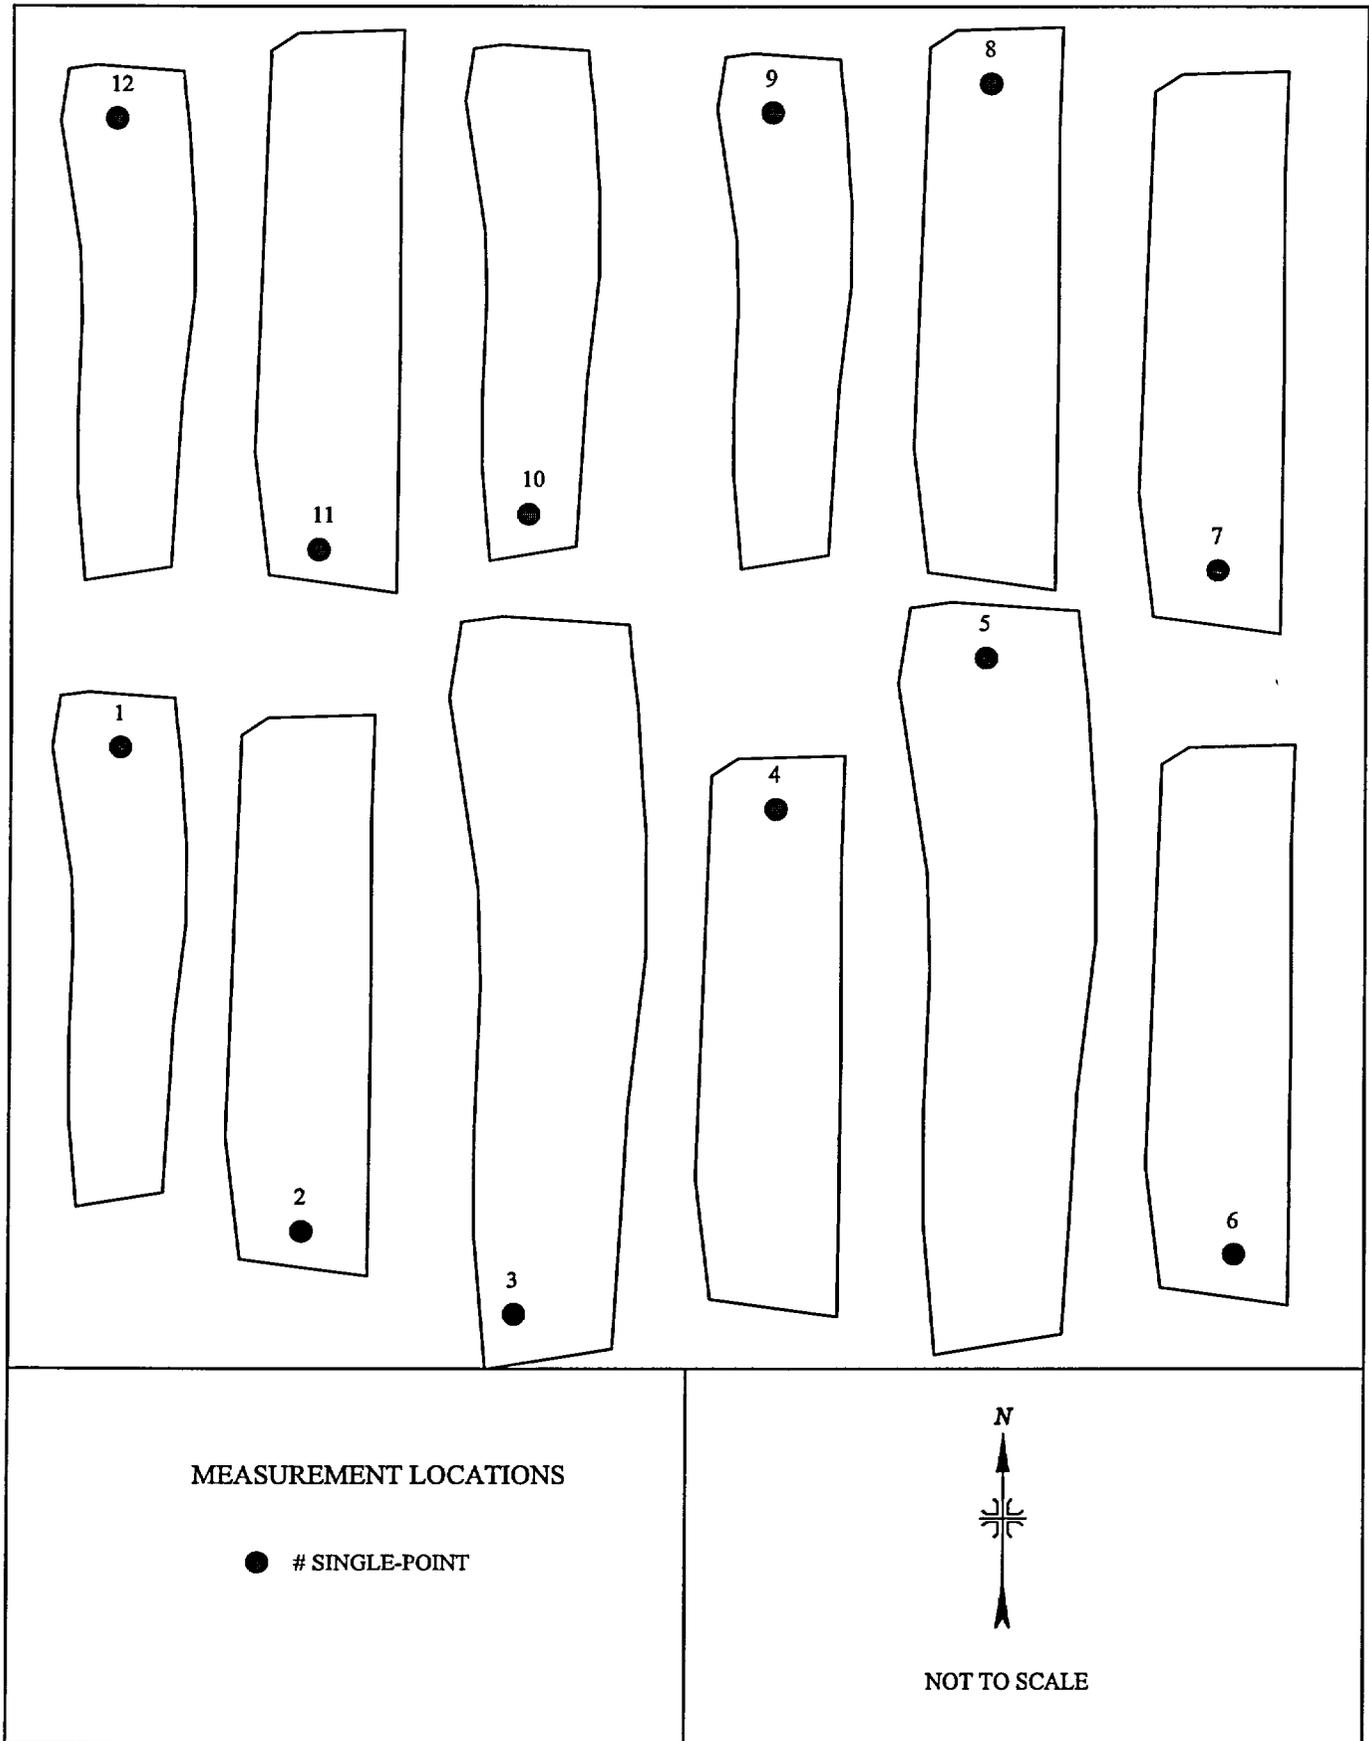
Building 31, Exterior West Wall - Measurement Locations
